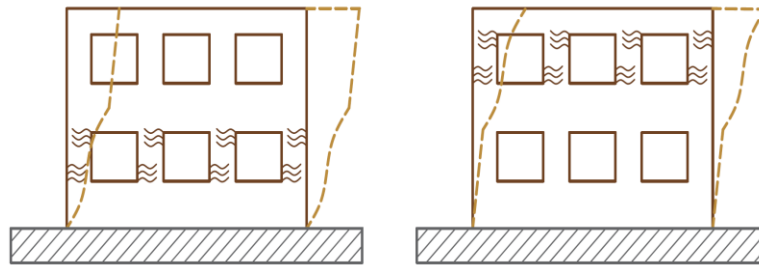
Collapse mechanism in CM buildings known as concentrated damage or soft story mechanism. Concentrated damage in the first floor (left), second floor (right) (adapted from Borzi *et al.* 2008).
